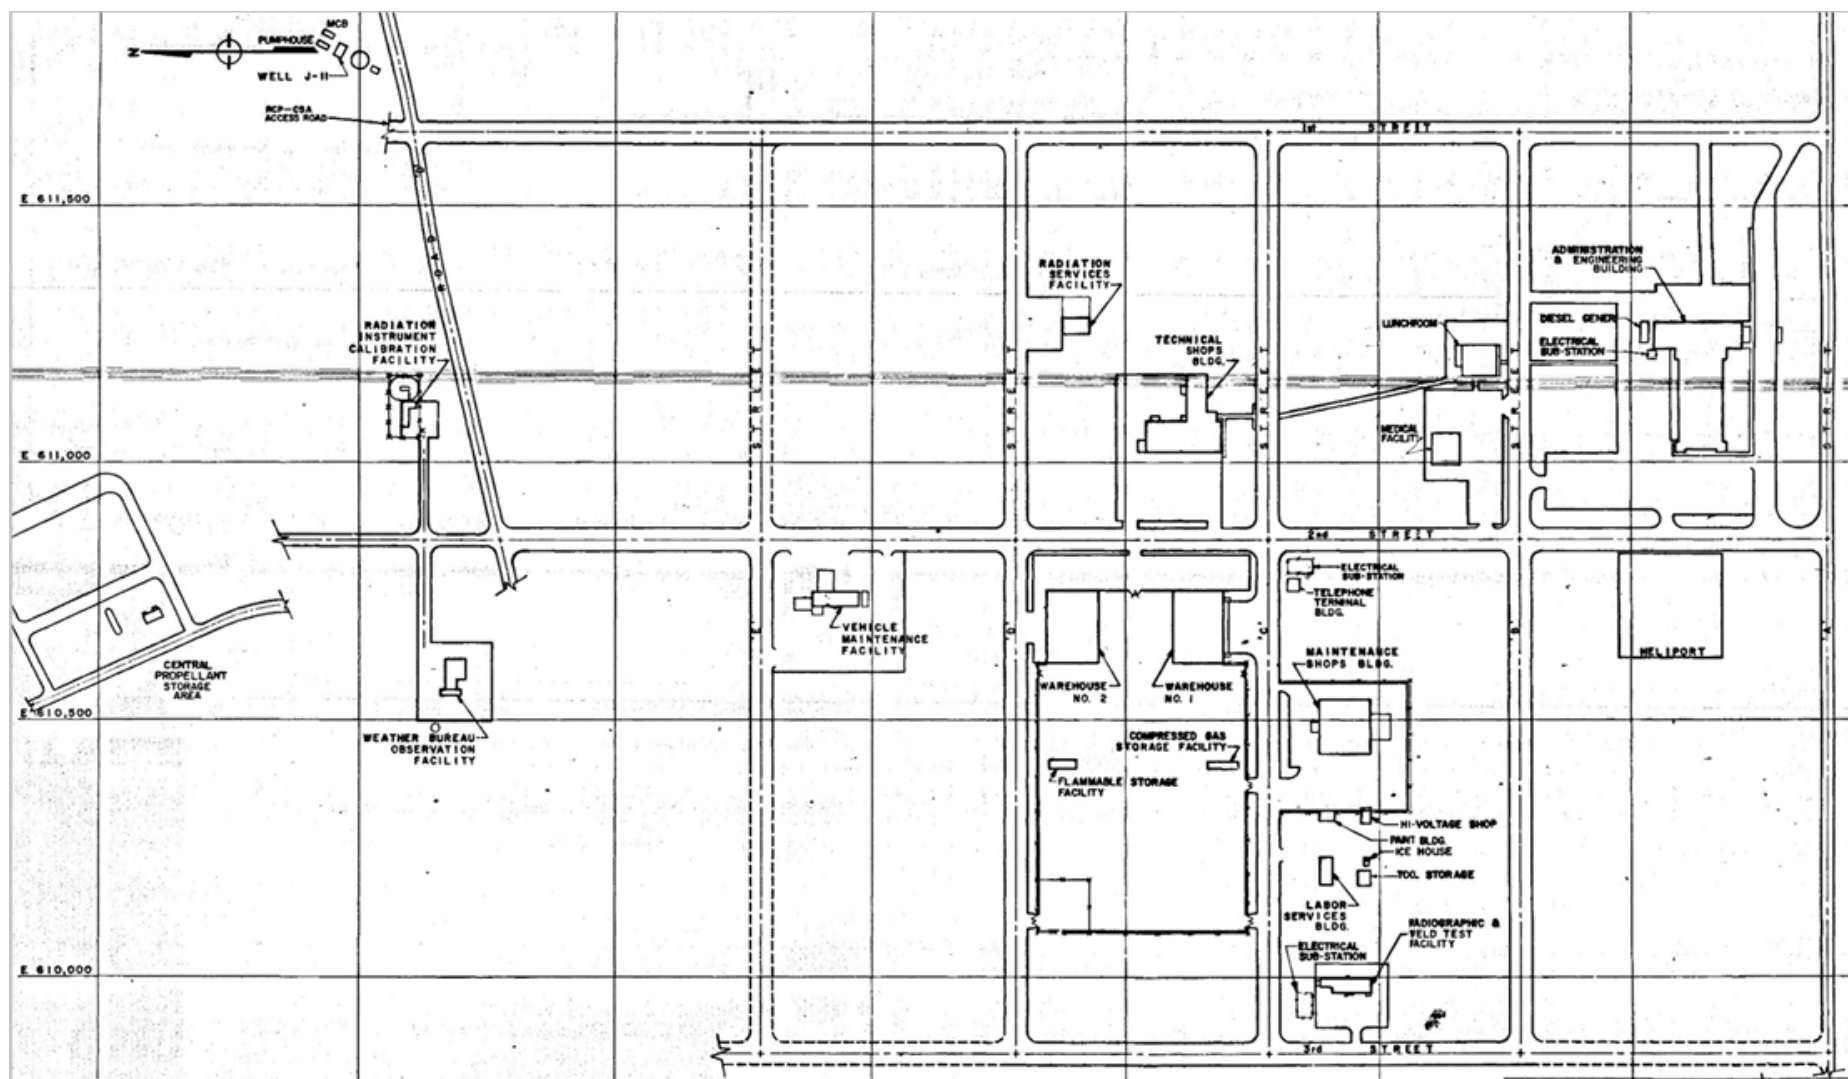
The Central Support Area showing buildings and streets as of 1965 (Pan American 1965).
